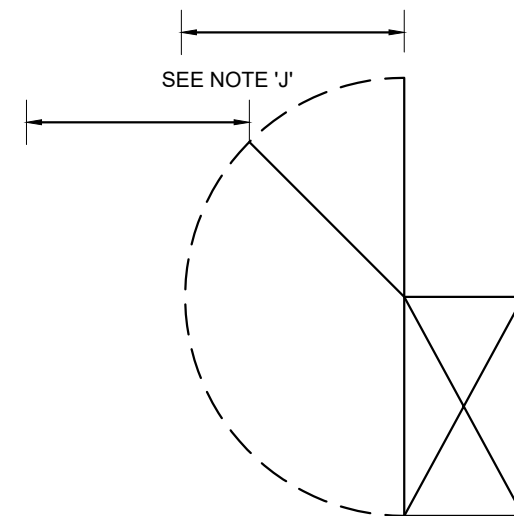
OVERHEAD VIEW DEPICTING EGRESS PATH OF DOOR
